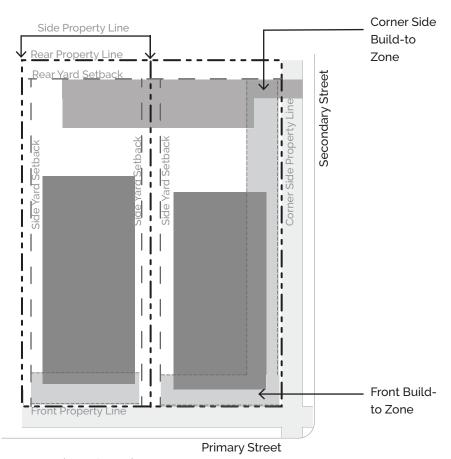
Build-to Zone, Property Lines, & Yards.
